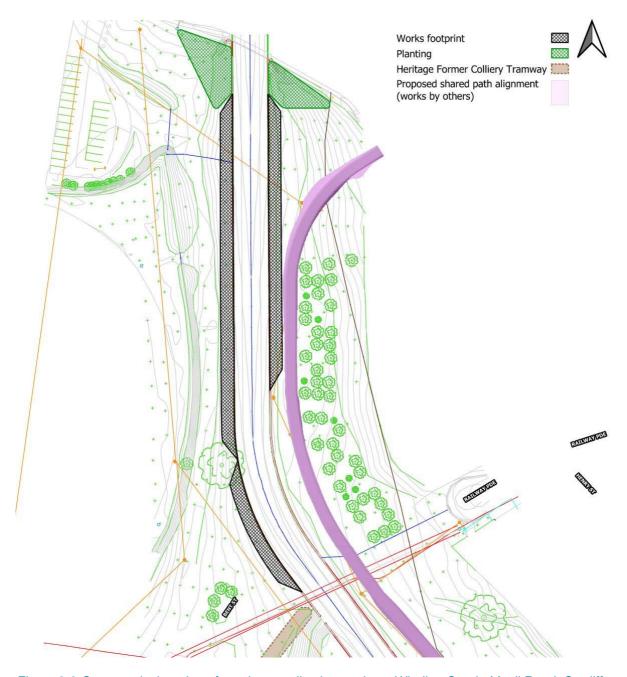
Concept design plan of creek naturalisation works at Winding Creek, Myall Road, Cardiff
